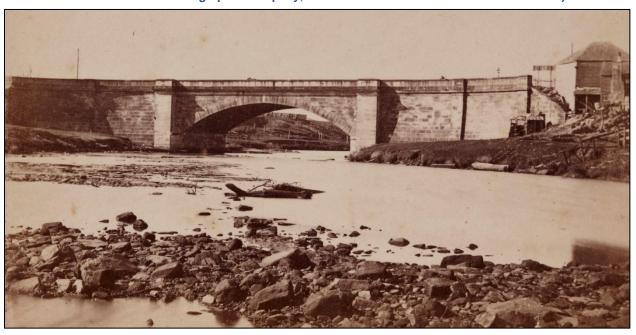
Detail of above 1870 photograph showing structures to the south-west of Lennox Bridge (including Items 7, 48 and 49).
